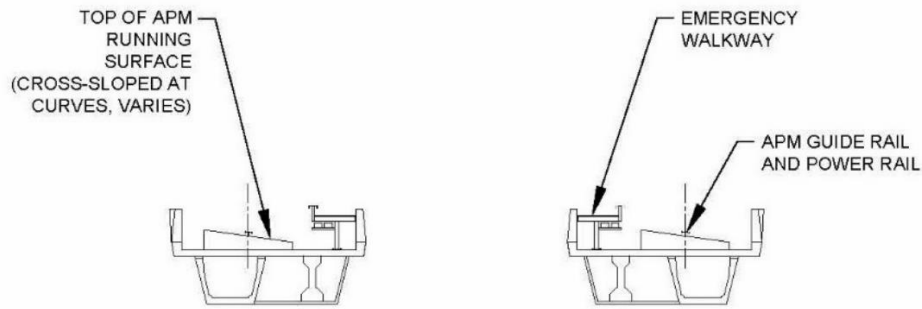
Existing Skylink Guideway Cross-Section at Curves (Approaching/Departing Stations)
